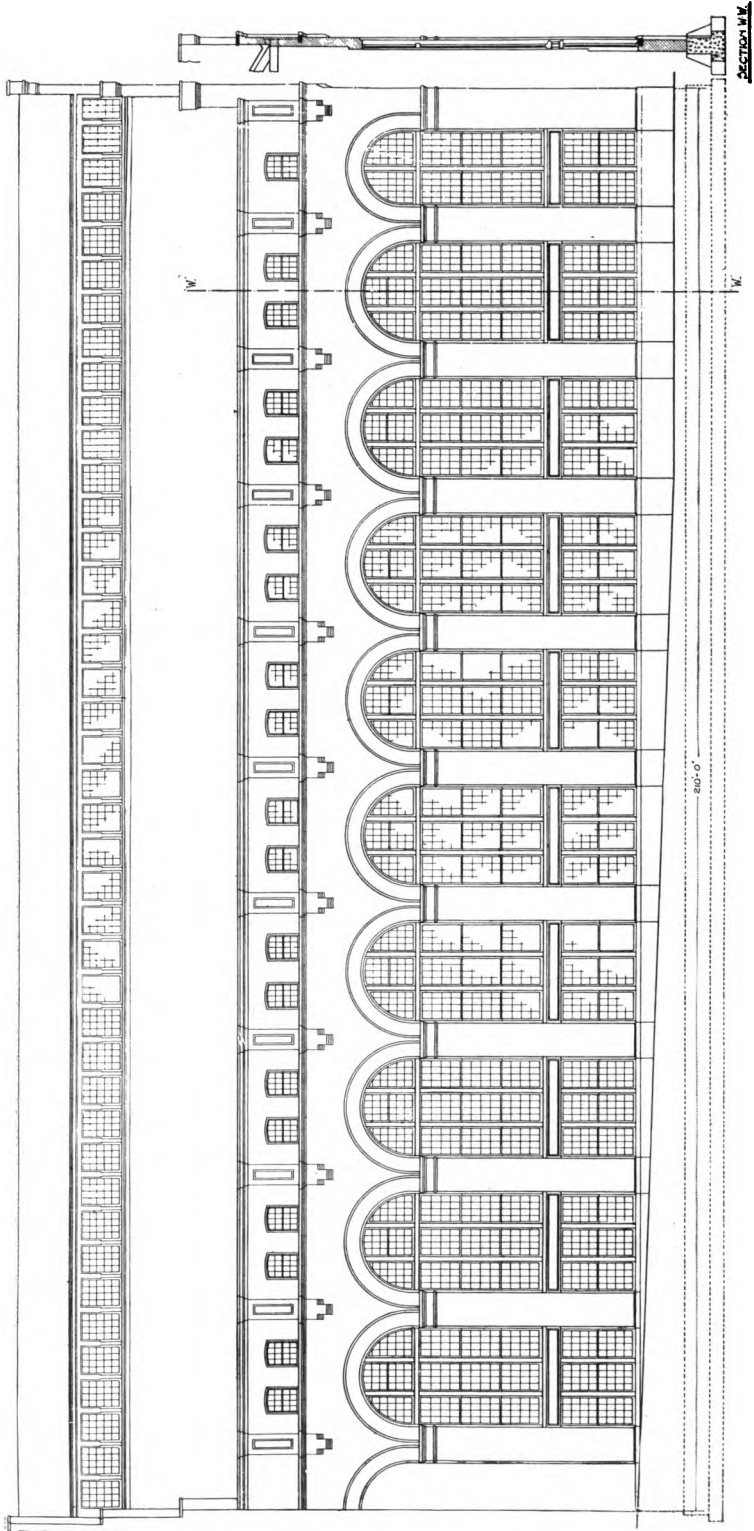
Elevation, Gold Street Front, Gold Street Station.
